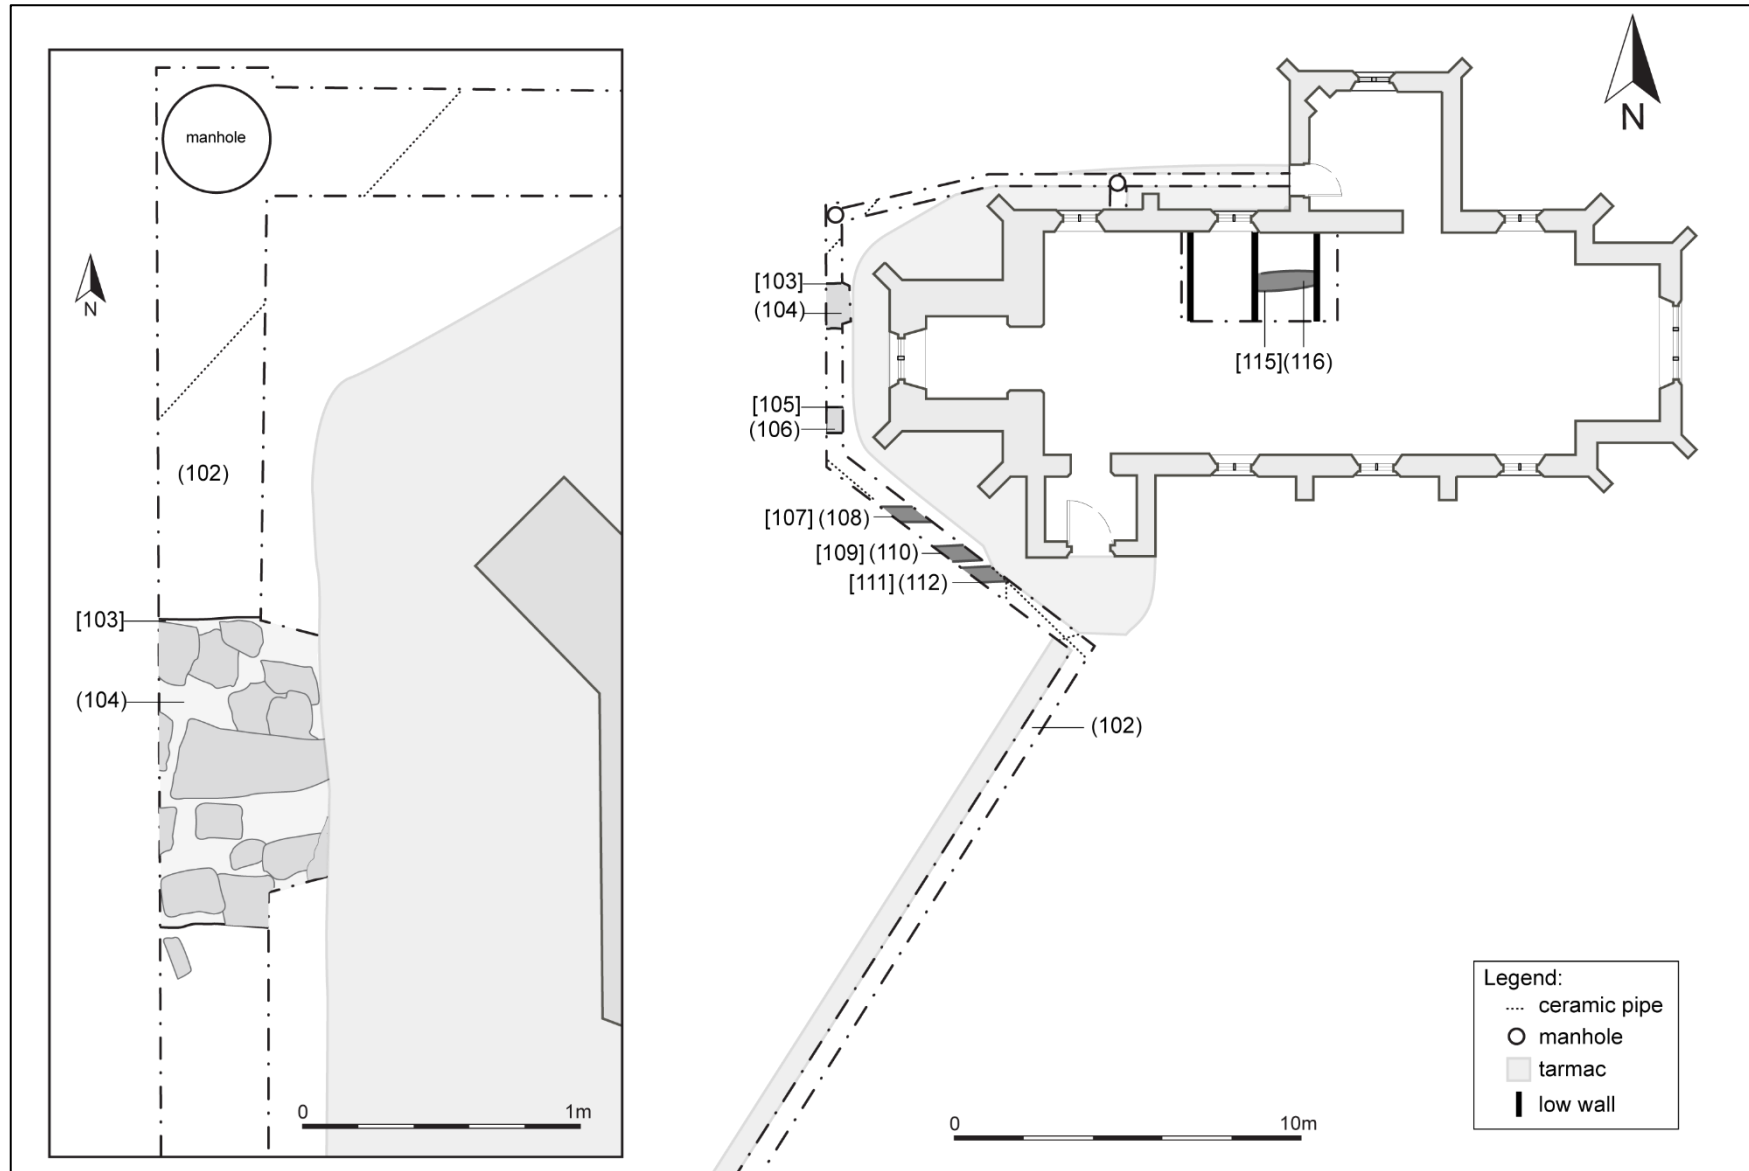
PLAN OF SITE SHOWING FEATURES WITH DETAILED INSET OF RUBBLE BUILD FORMING WALL FOOTING [103].
